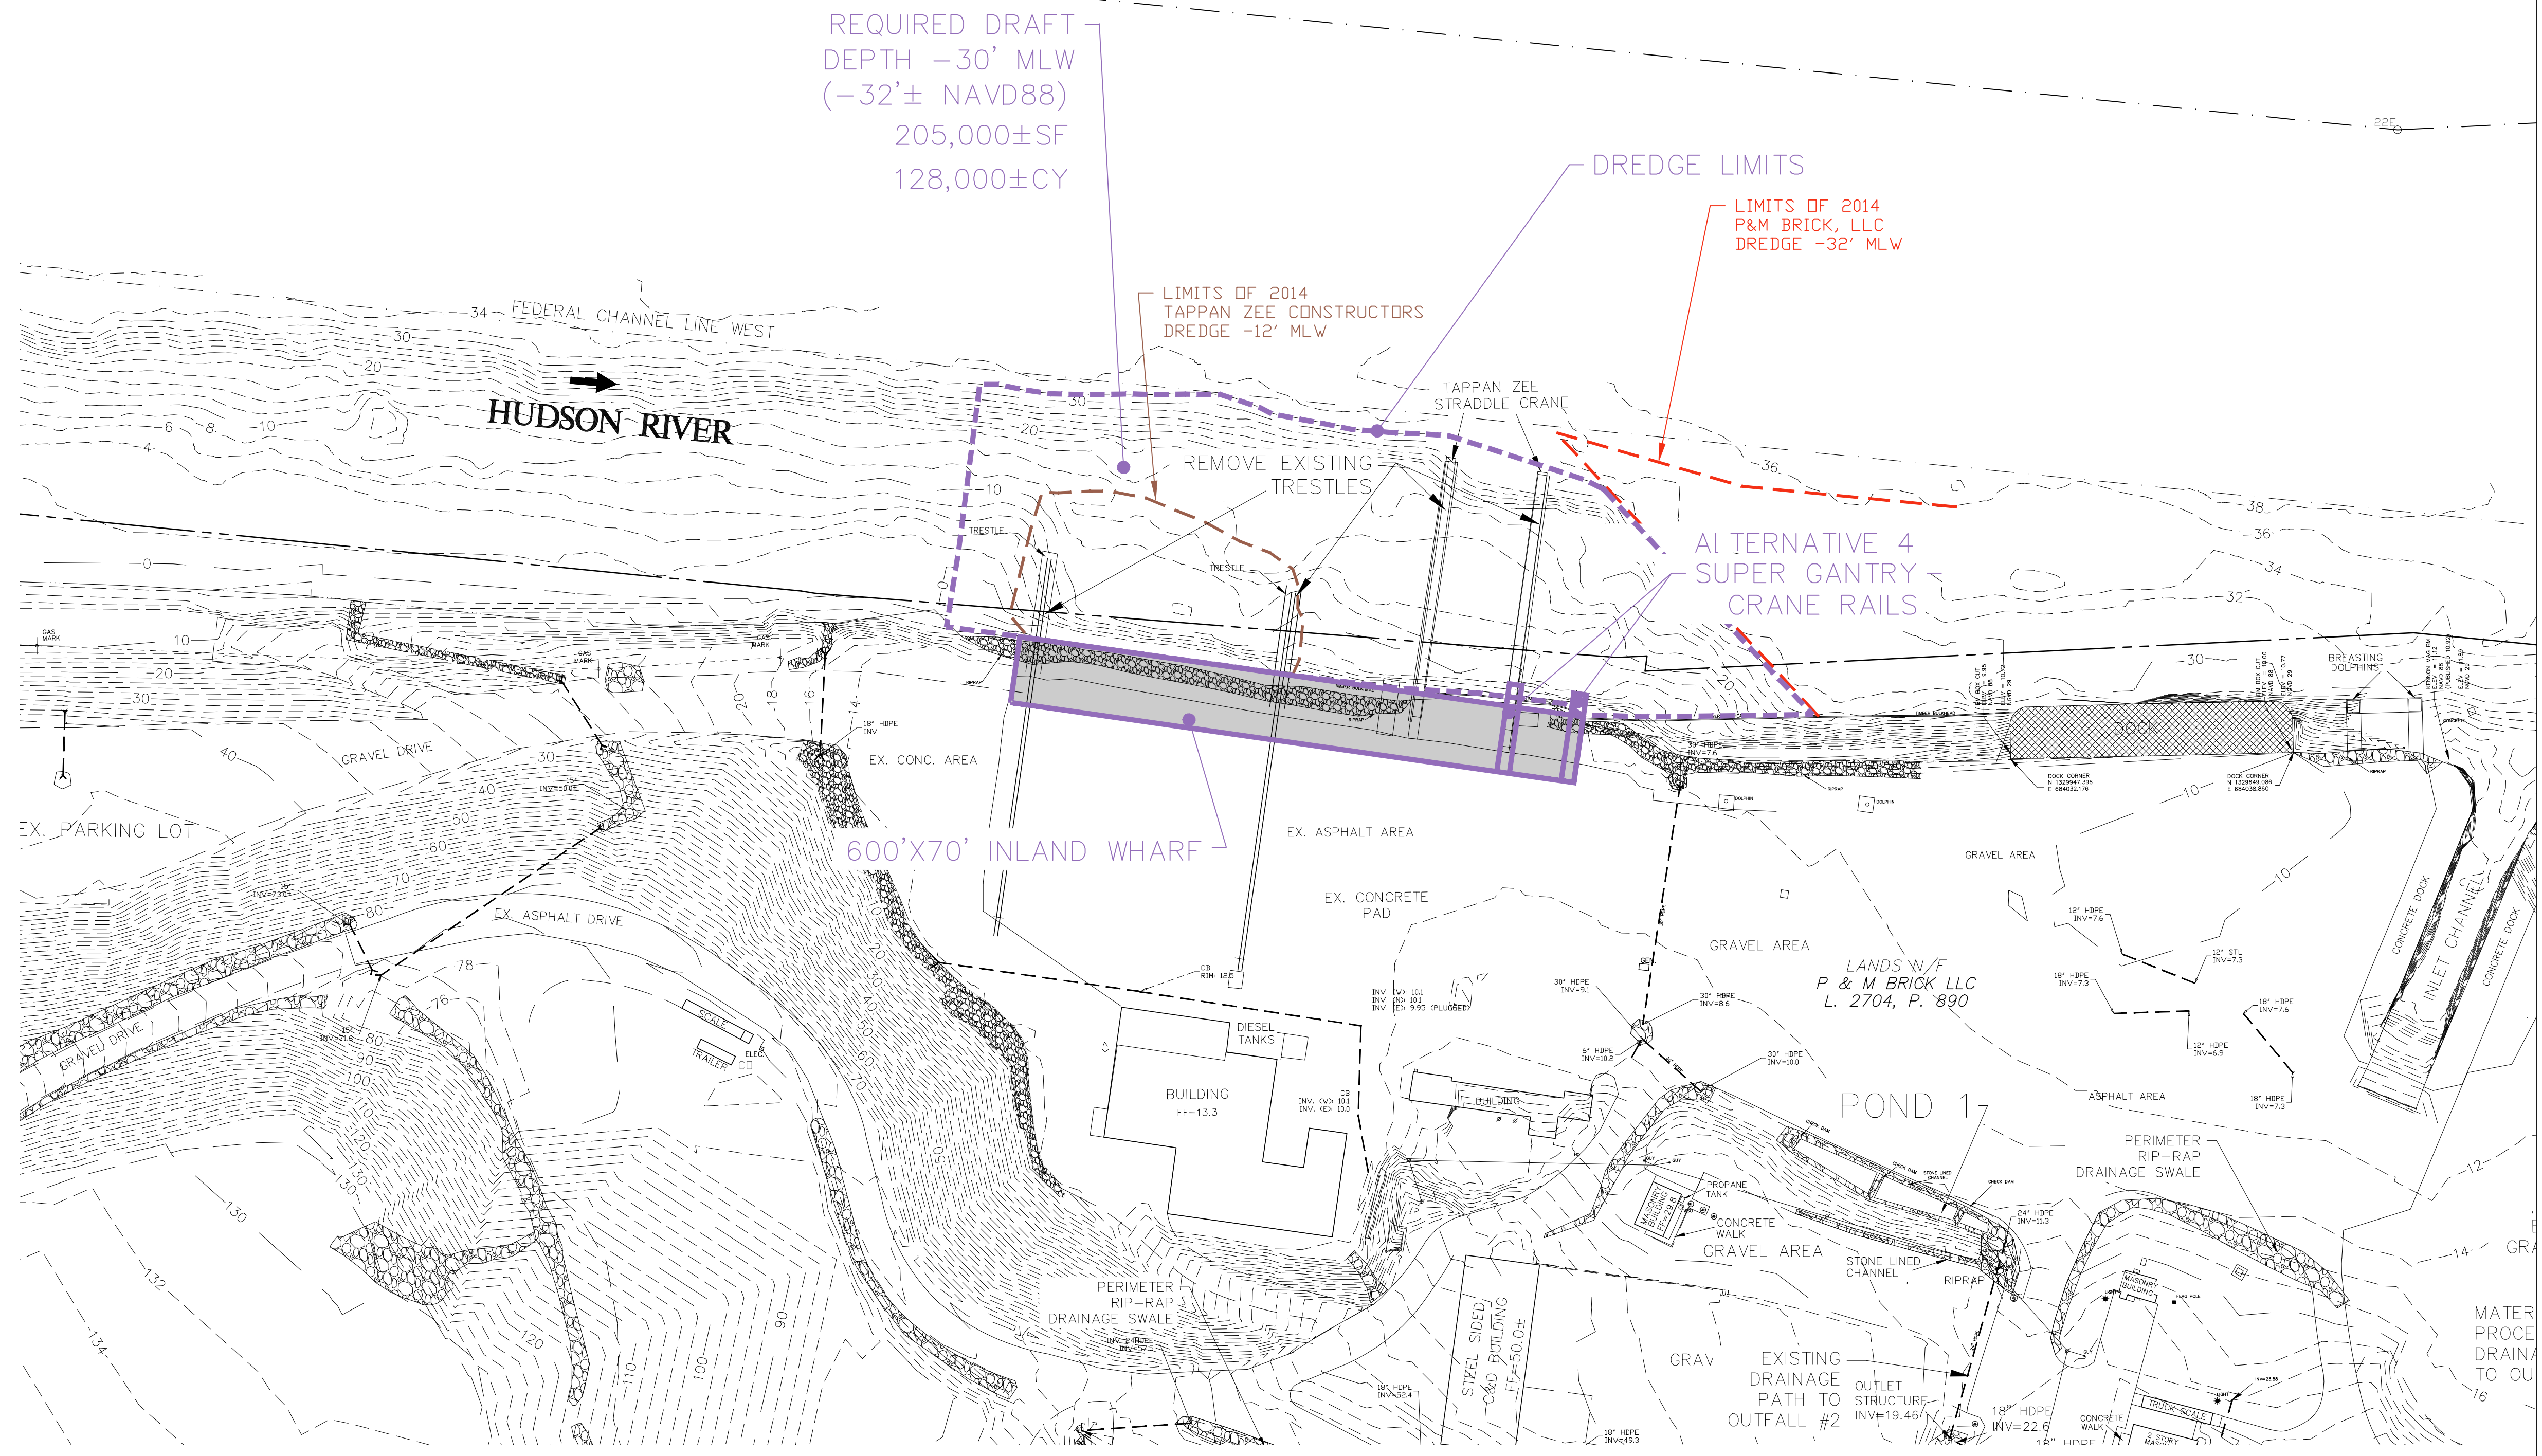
FOR INFORMATION ONLY NOT FOR CONSTRUCTION
